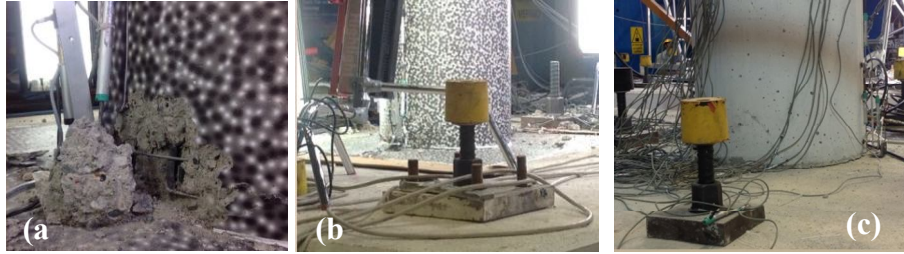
Crack opening and buckling phenomena at the bottom section of columns in the Short (a,b) and Tall pier (c) after test k12
